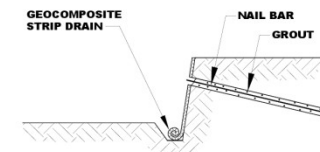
Typical Cross-Section of a Soil Nail Wall.
